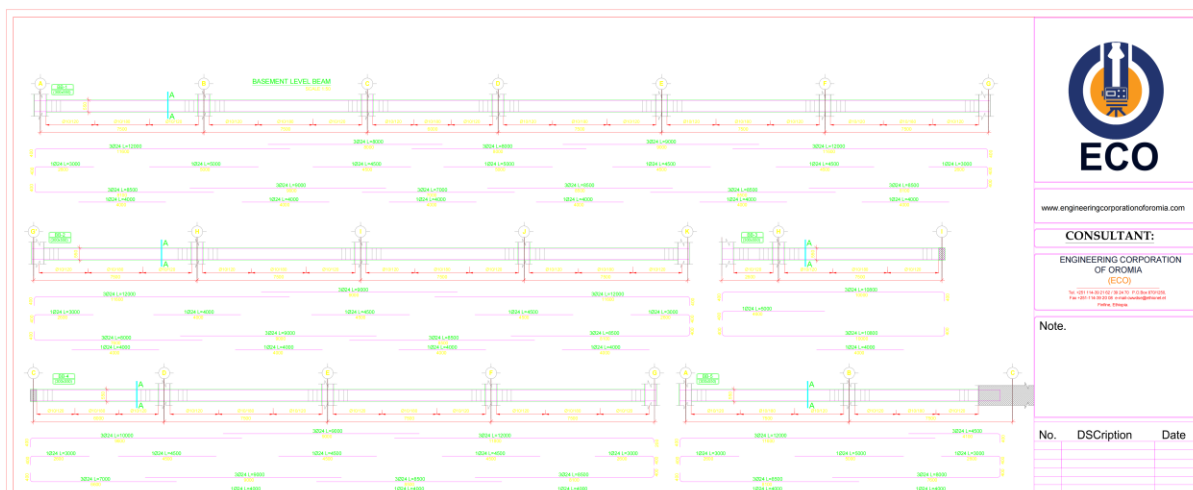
MHB Basement Beam Structural Reinforcement and Dimensional Details.
